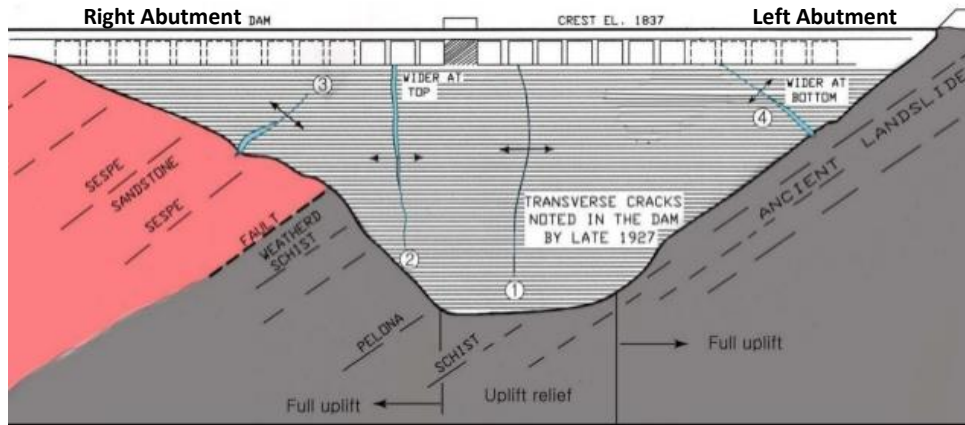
Cross section of St. Francis dam looking downstream (Hartley, 2016)
